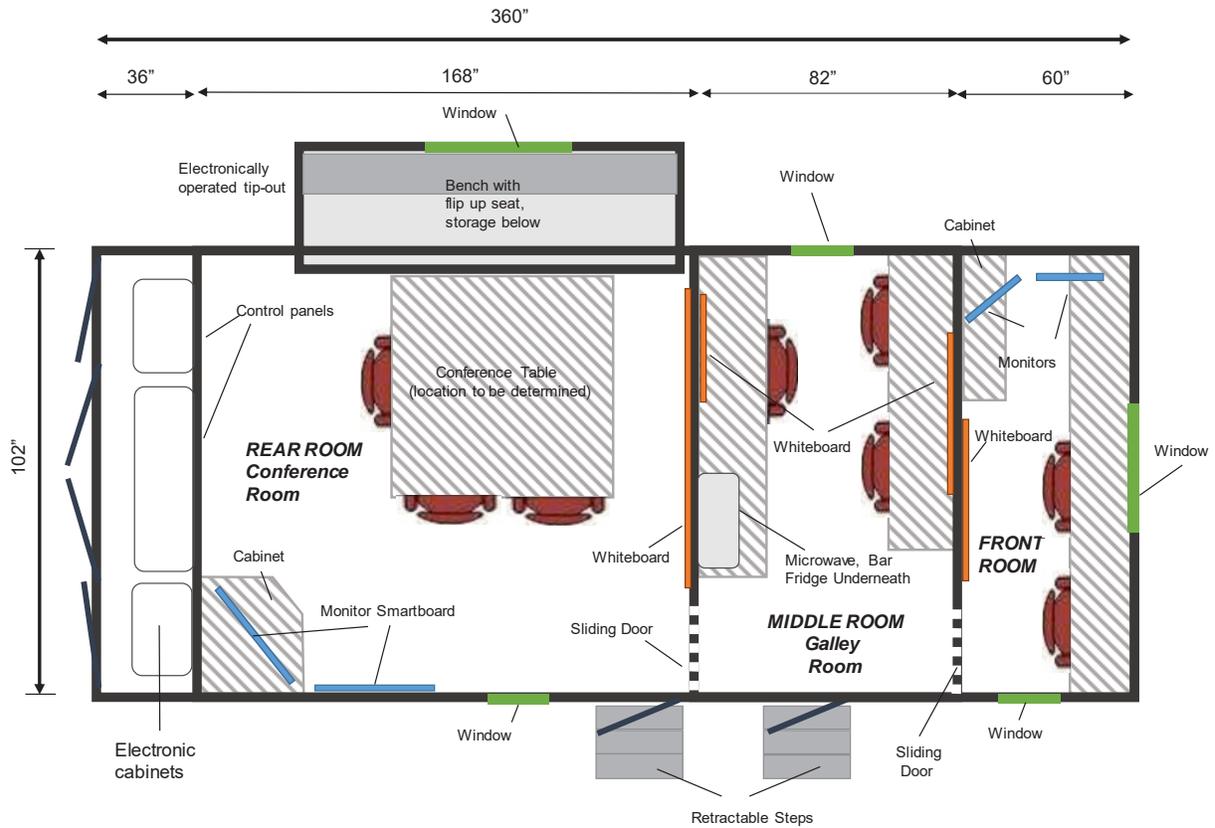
Plan View Schematics of Trailer (for overall dimensions and schematic layout purposes only) All dimensions are minimum requirements.
